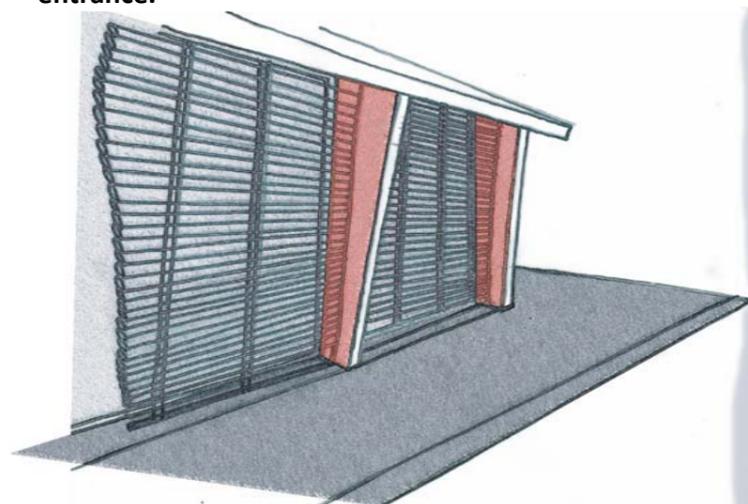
Sketch of louvre system on the western façade. With concrete frames painted red to create a focal point.
